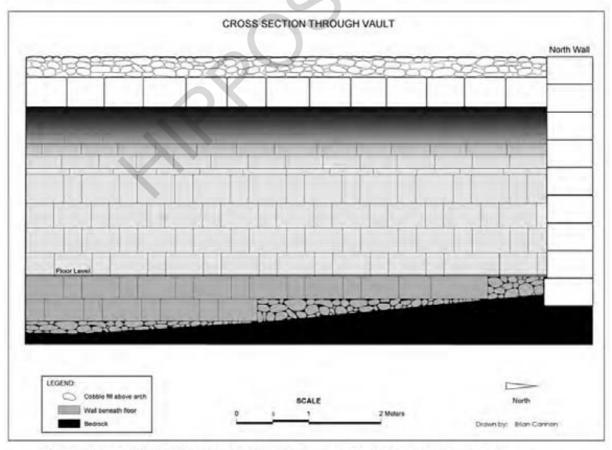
, Hippos 2006, SWL-I. Section III. The vaulted chamber. North-South section. Suggested reconstruction.
